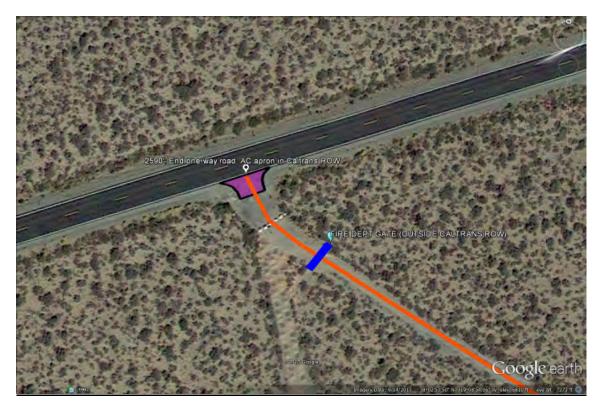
HWY 167 INTERSECTION DETAIL
